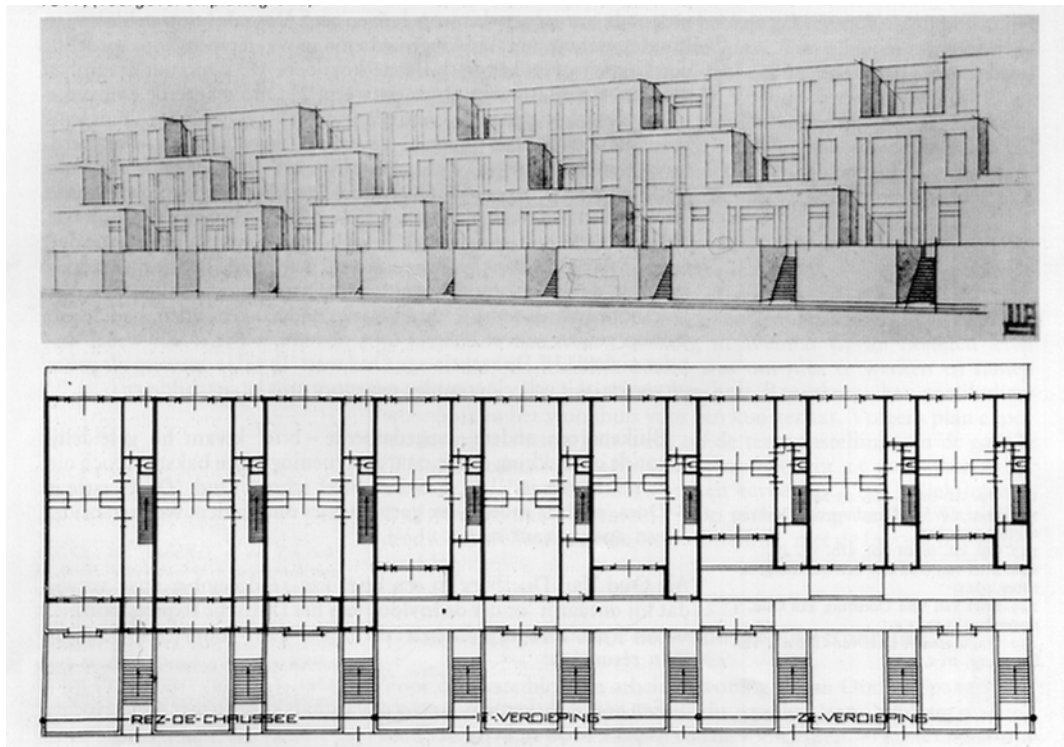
Row Houses, Strandboulevard, Scheveningen, 1917, perspective & plan layout
